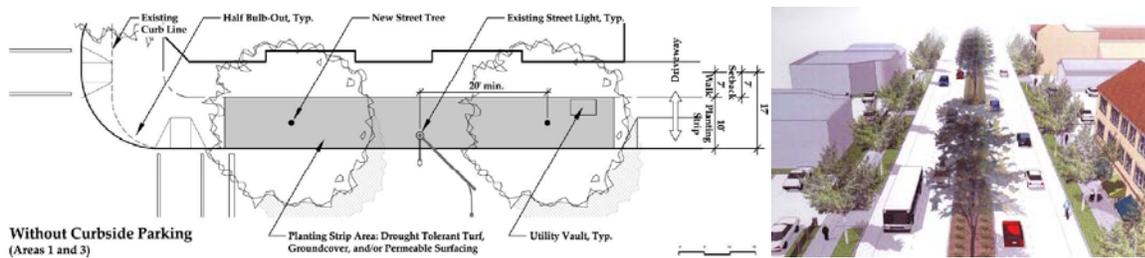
& 2 – WBMP Streetscape Improvements (10 foot landscape strip & 7 foot walk)
